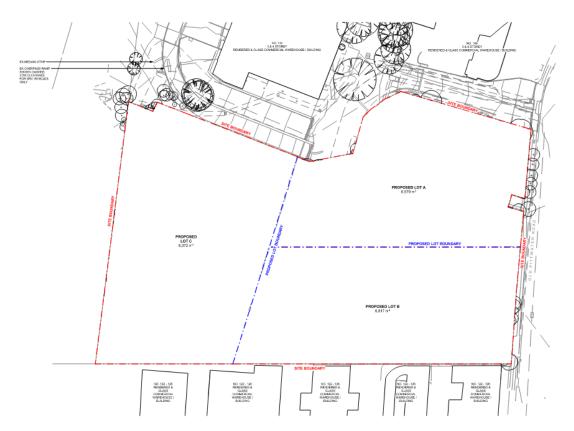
Subdivision Layout (Source: Reid Campbell)
